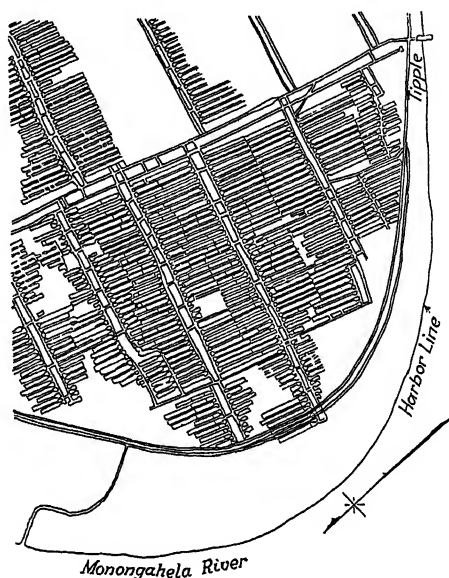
PLAN OF MINING THE PITTSBURGH COAL, 4TH POOL, FAYETTE COUNTY, 1860–1880.
